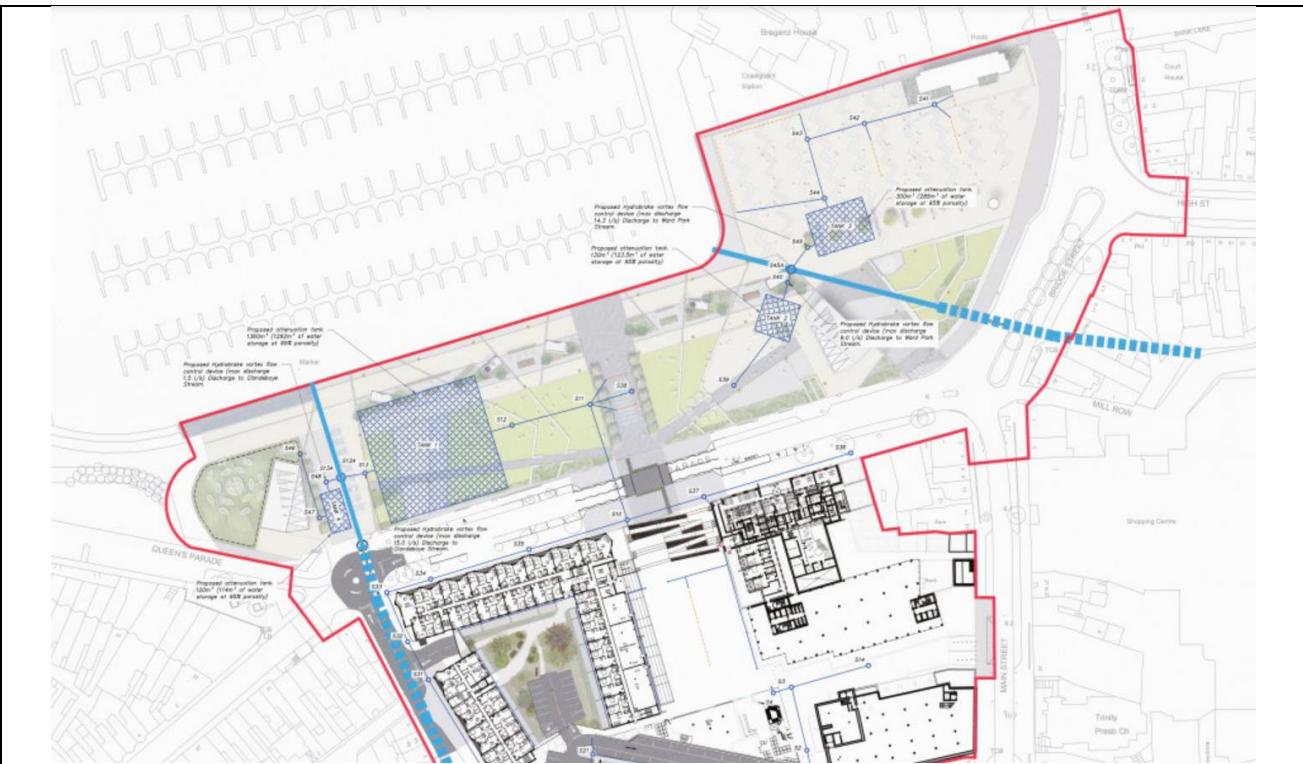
Original approved drainage proposals (LA06/2020/0097/F) showing attenuation tanks underground
